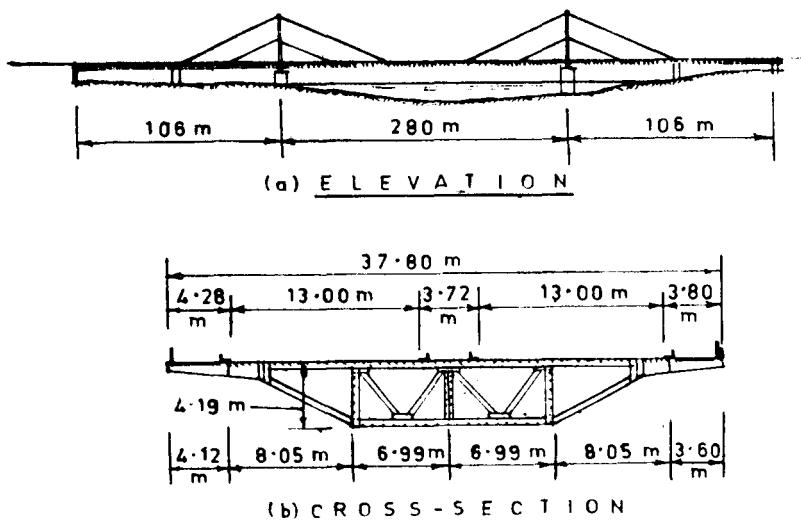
·15 BRIDGE OVER THE RHINE NEAR
